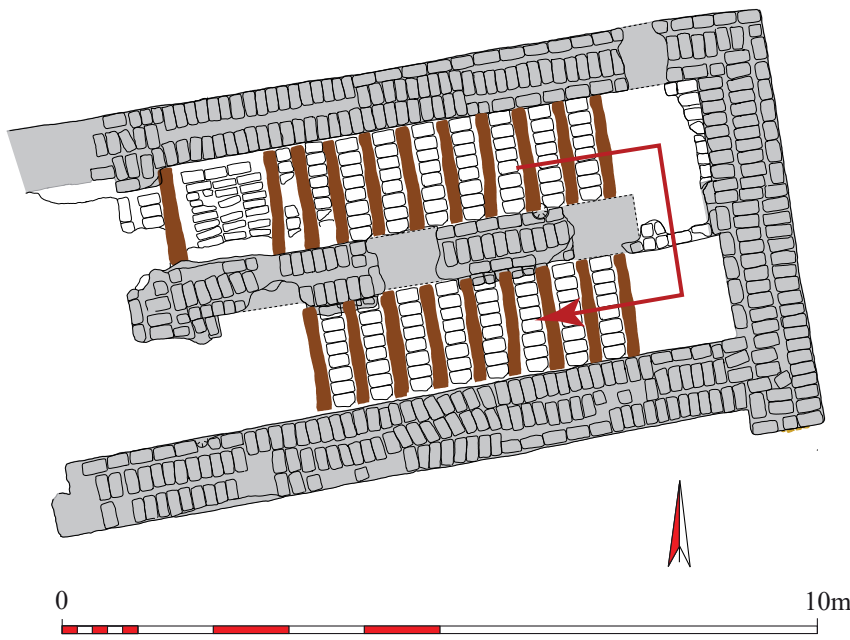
Building F1. Suggested reconstruction of the stairway in Room I (scale 1:100).
